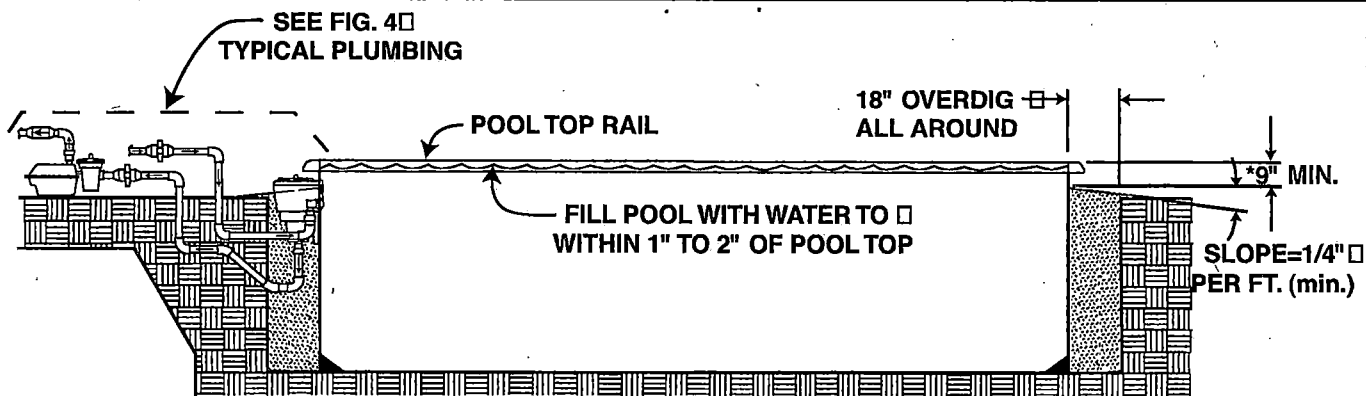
PREPARATION FOR CONCRETE OR PAVER BLOCK DECK INSTALLATION
